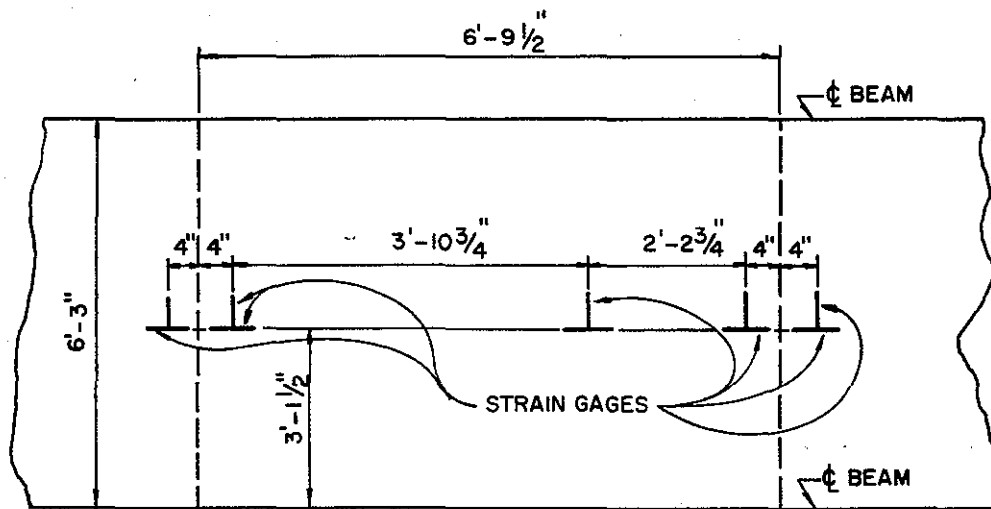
Layout of Electrical Resistance and Beam Deflection Gages on Full-scale Bridge.
